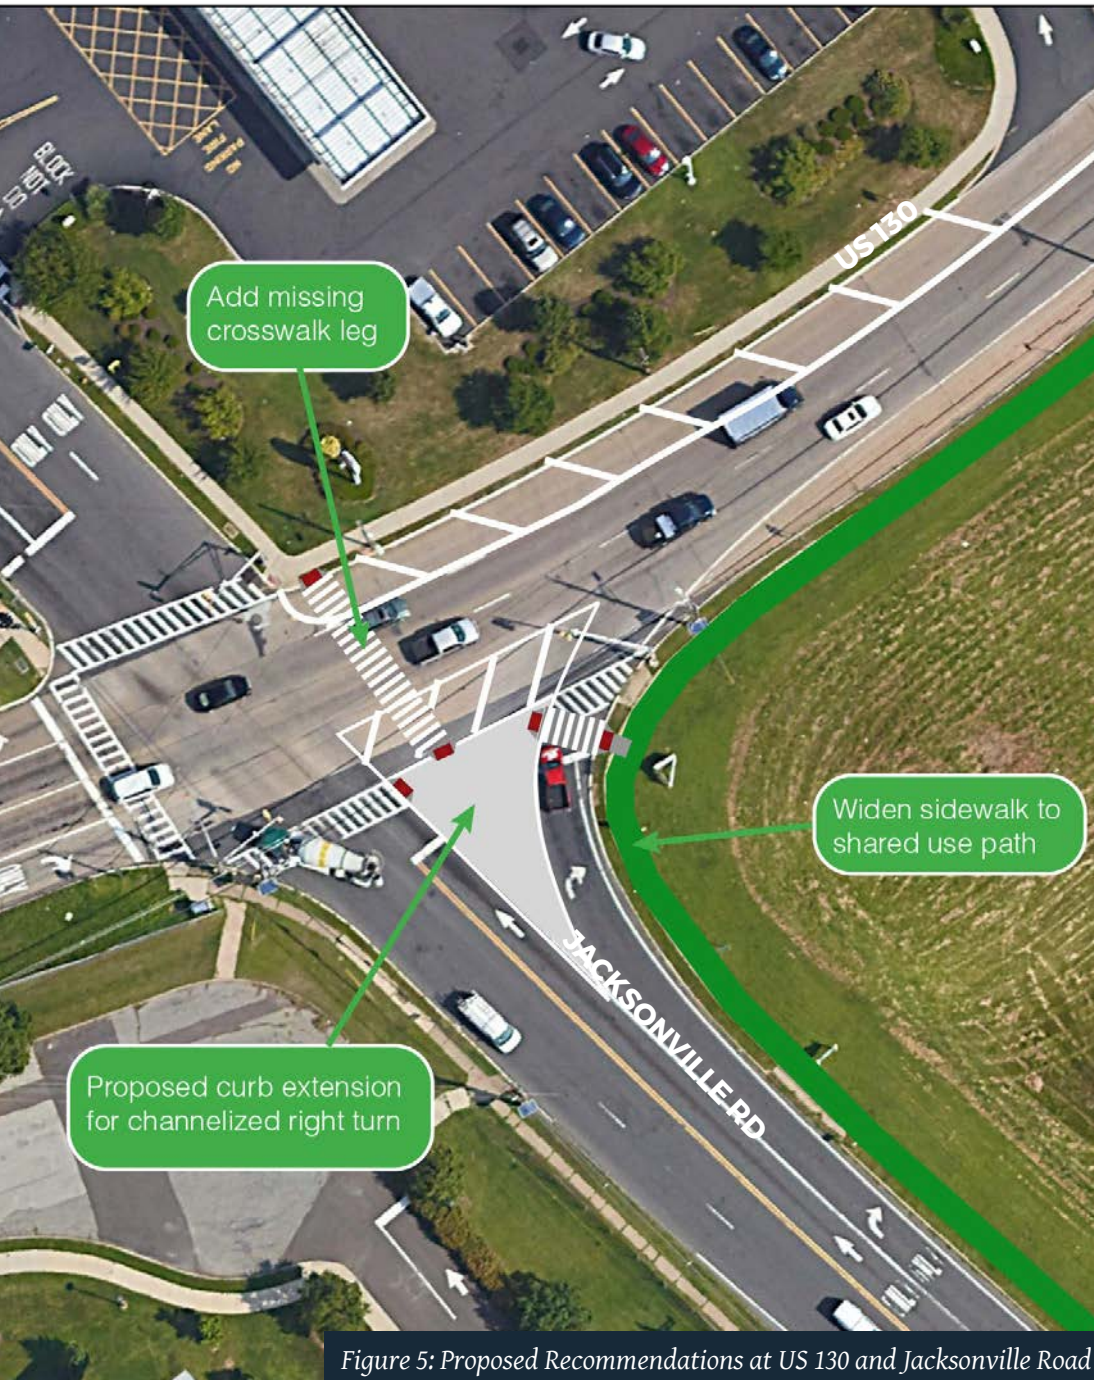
Proposed Recommendations at US 130 and Jacksonville Road
